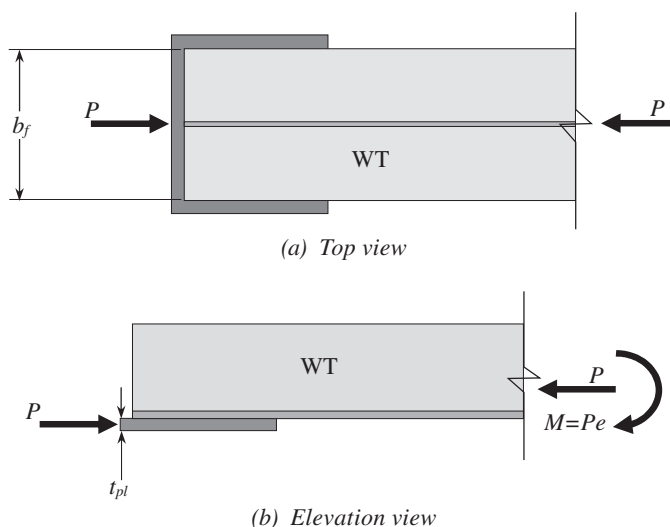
Typical end connection of WT compression members (joint details not shown).
